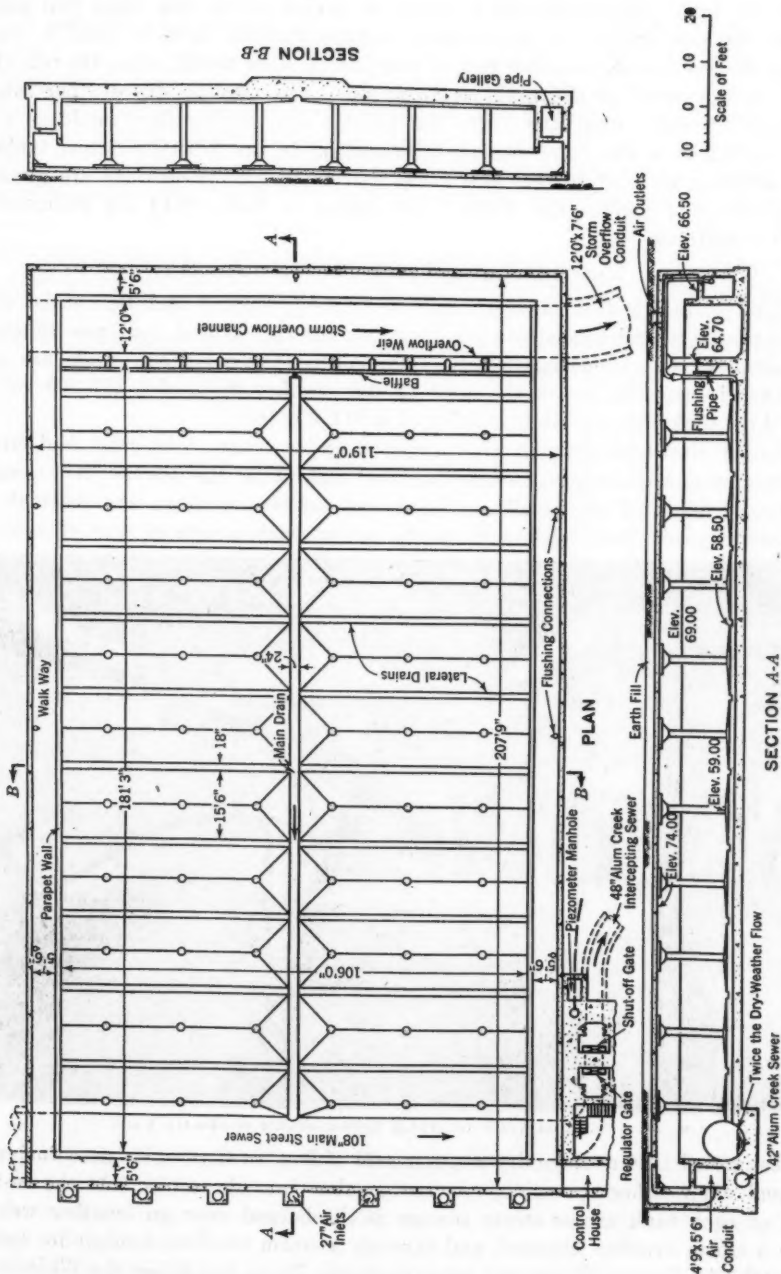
DETAILS OF ONE OF THE STORM STAND-BY TANKS ON WHITTIER STREET, COLUMBUS, OHIO.
